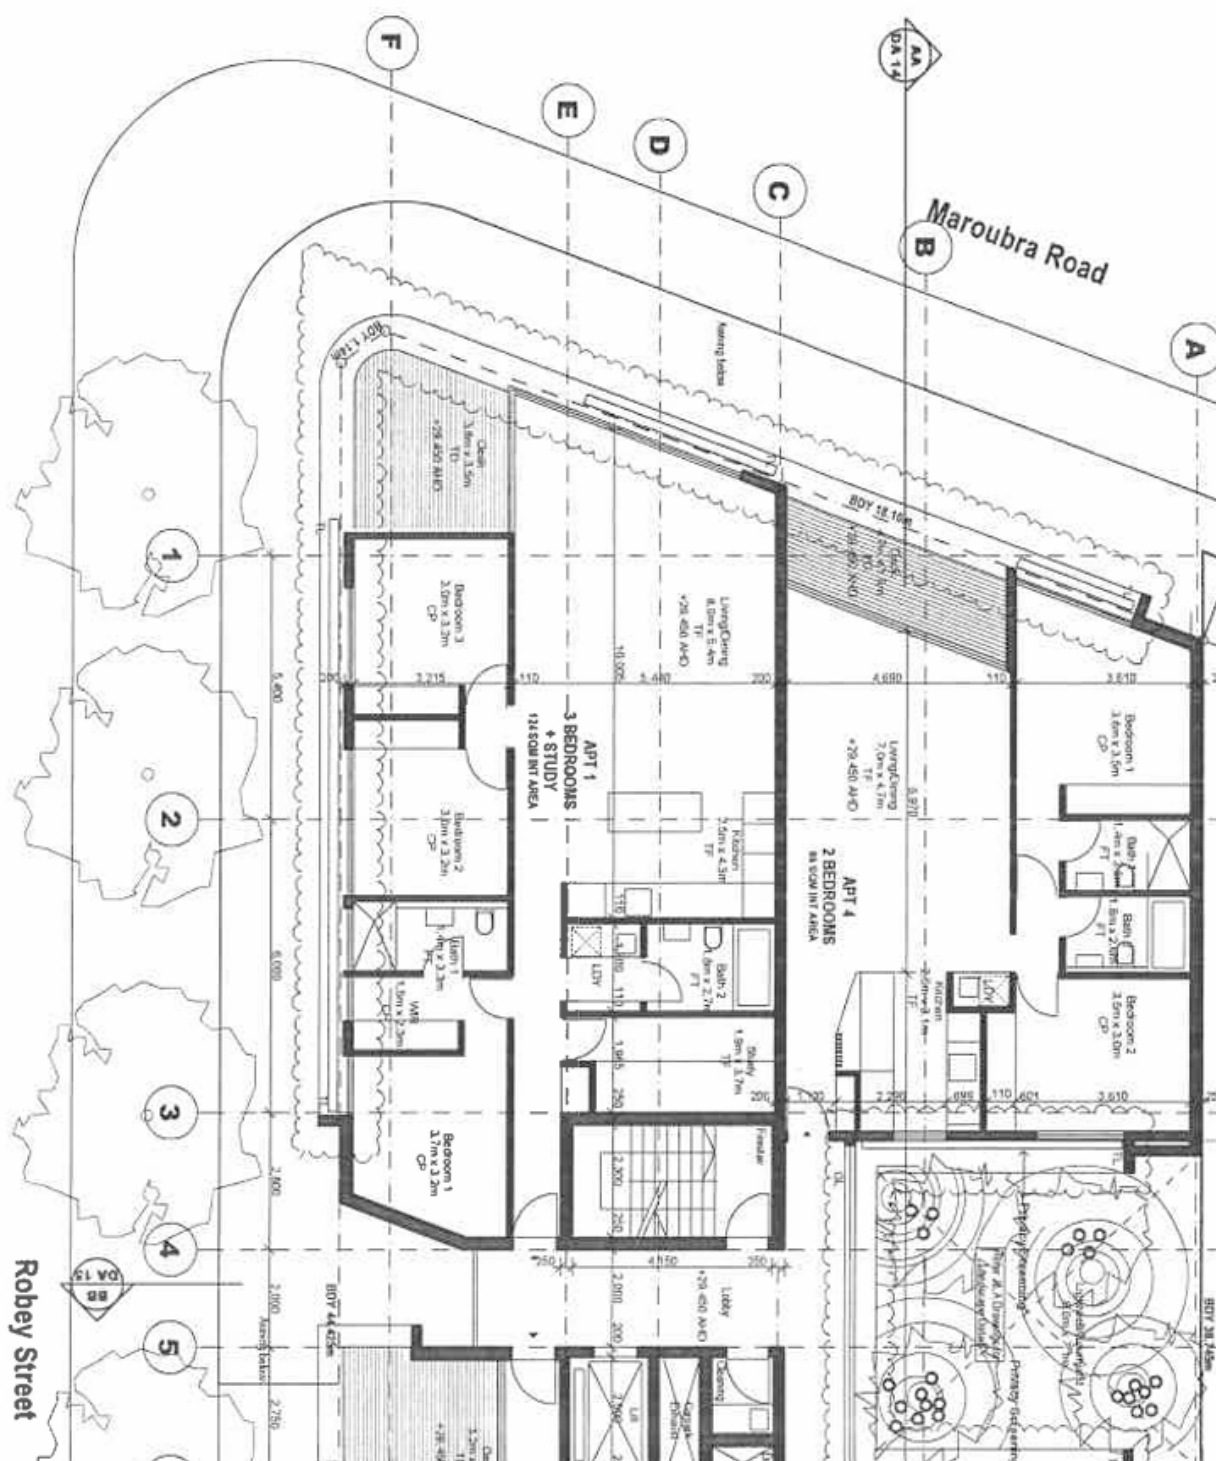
Excerpt from notification plans 165-167 Maroubra Road, DA/503/2008/B (approved 2009)
